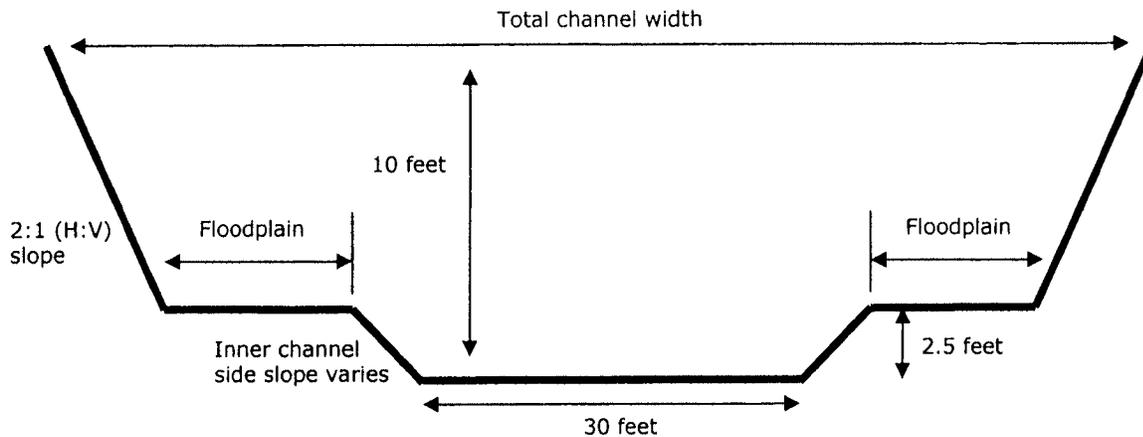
TYPICAL DESIGNED CROSS-SECTION OF THE PROPOSED CHANNEL
